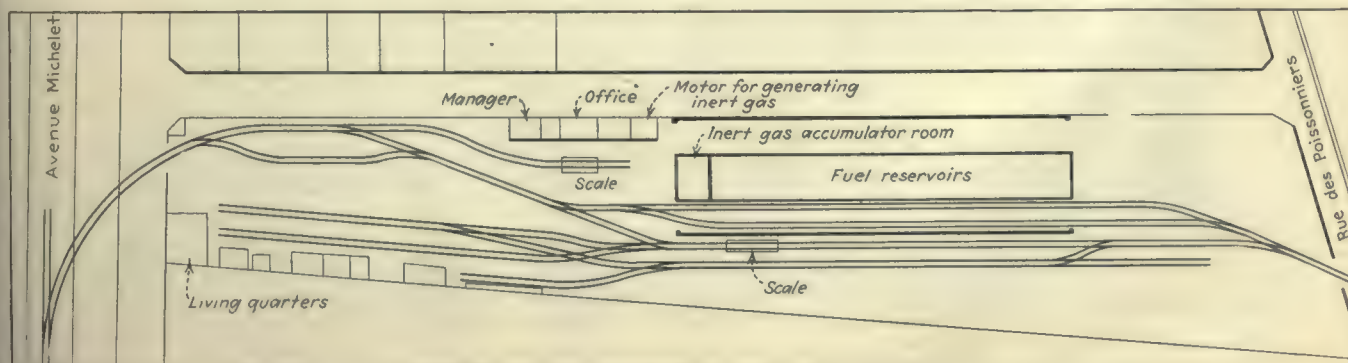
Plan of central storage area showing position of buildings and switch tracks
